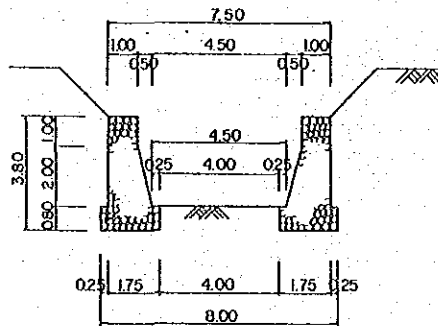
CROSS SECTION OF IMPROVEMENT PROJECTS PRESENTLY UNDER CONSTRUCTION
